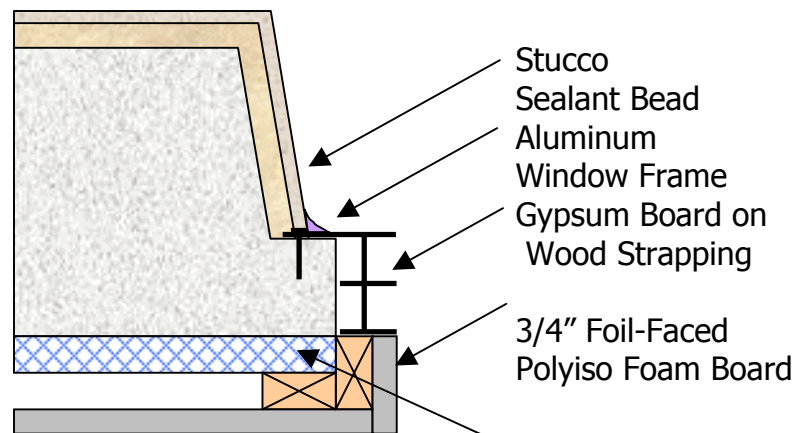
Detail of window surround with cast-in “buck” to receive the window flange. Cast-in projection against which the window flange is nailed and sealed.
